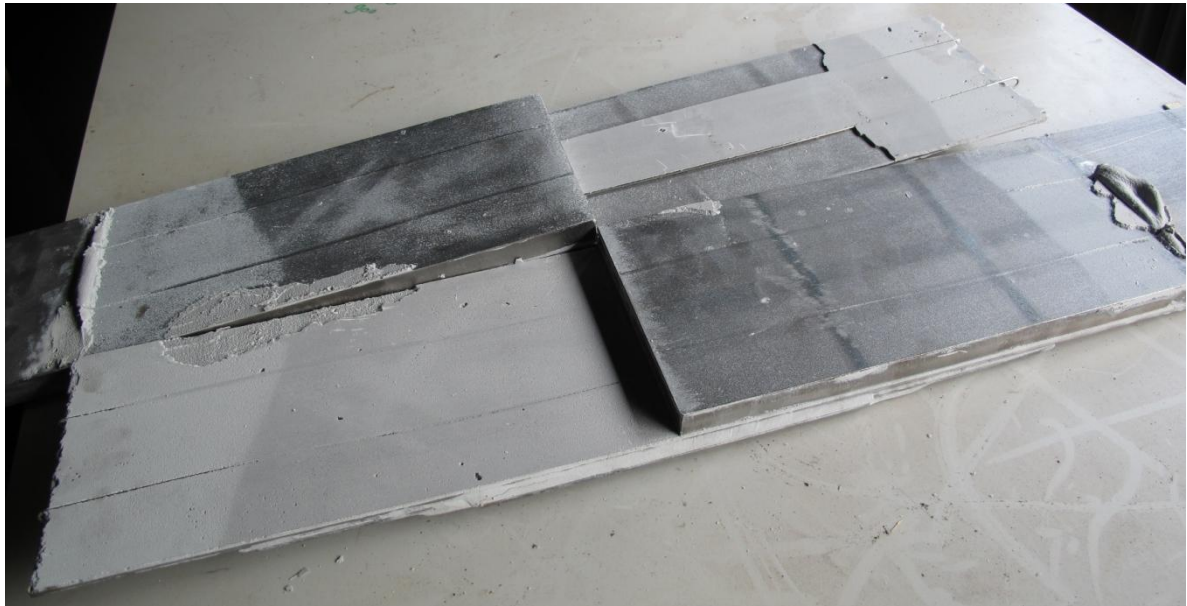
Connection 3 – Complete delamination of first adhesive layer in Z-shape
